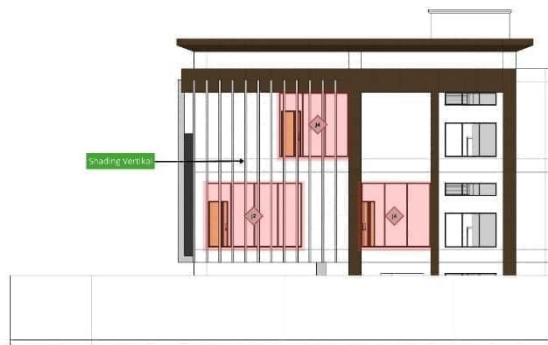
(a) Type of openings and shading on the north elevation (source: author, 2026)
